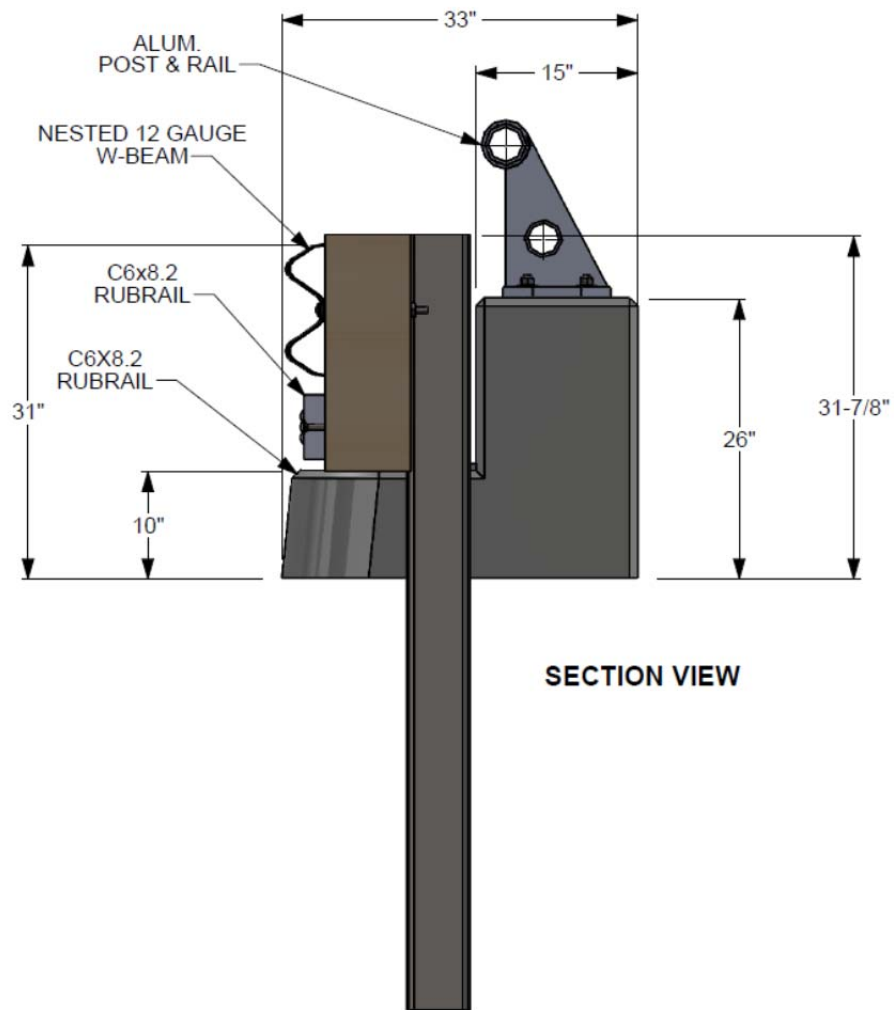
Section Details of Combination Concrete Rail with Aluminum Post and Rail
